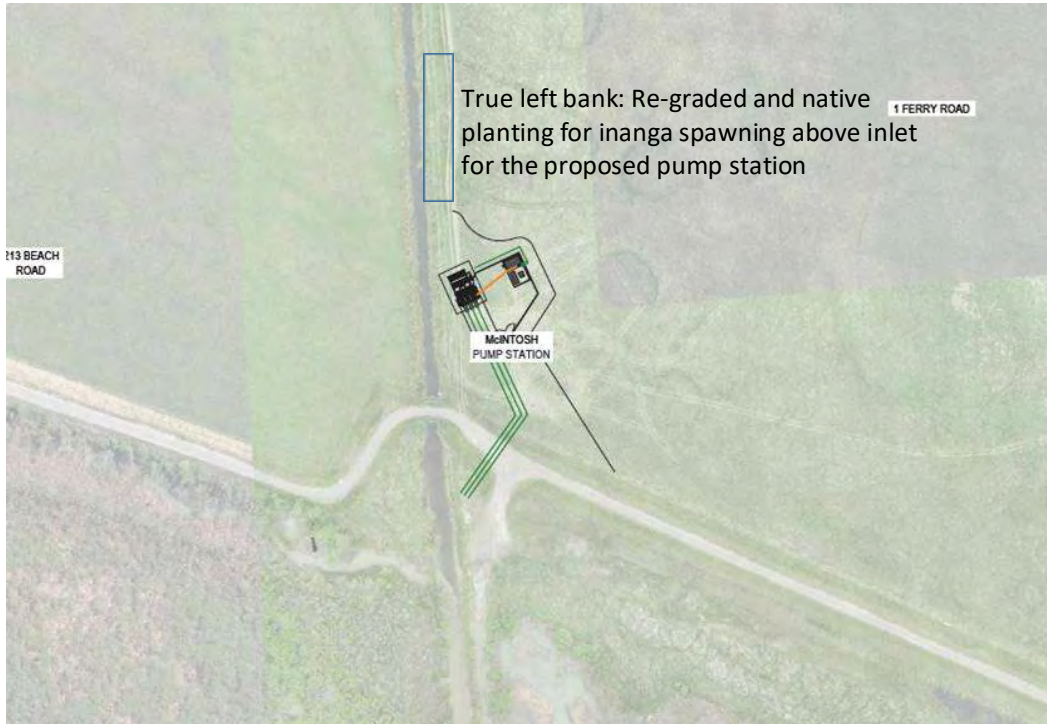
The location of the proposed bank re-grading, followed by native planting on the McIntosh Drain, north of a proposed pump station.
